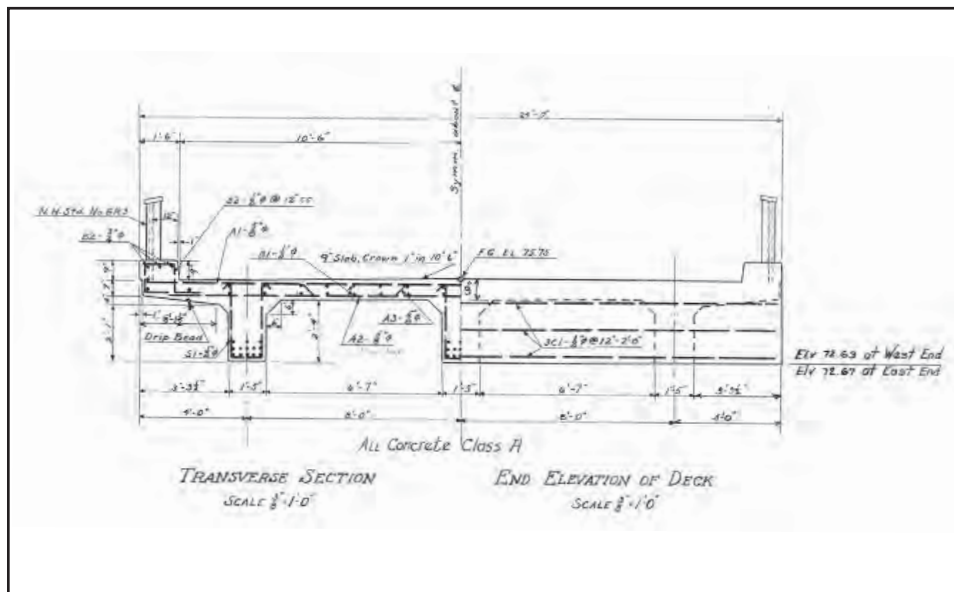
Detail from a plan for a T-beam Bridge Carrying Brentwood Road over Little River, Town of Exeter (State Bridge No. 075/078). July 1934. This was Whittum's first design for the SHD. It was typical of the projects assigned to him during the first six months of employment (NHDOT Bridge File P23).
